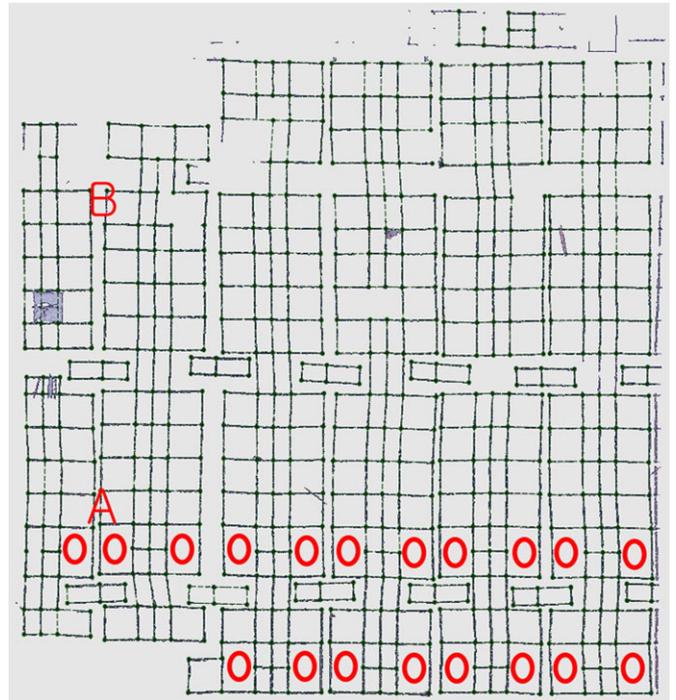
An example of a floor plan drawing of Fig. 4. The prefabricated shoring system was not installed along the beam so it was not parallel to each other; For example, points A and B and some members shown on the construction drawings were not installed, as indicated by red circles.
